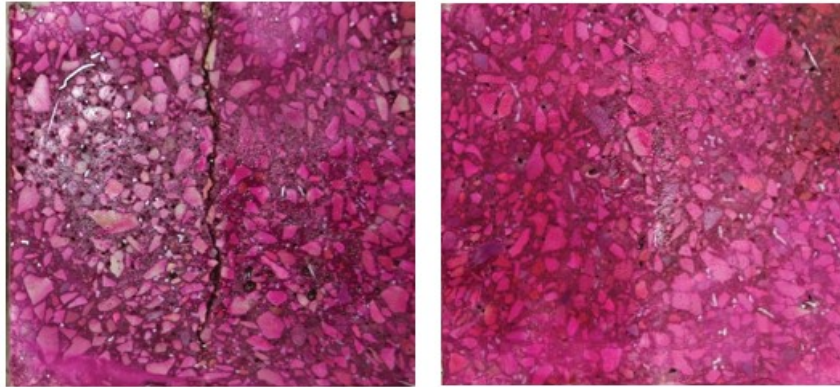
Surface Cracks Healed in Specimens with Large Cracks Healing under WD Cycles, and Internal Crack after Cutting the Cylinder Transversally to the Crack
